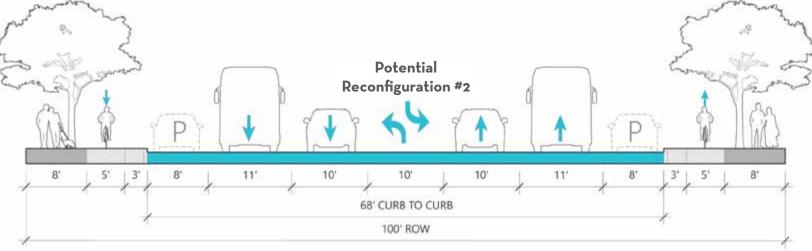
Potential Reconfiguration #2: One-Way, Sidewalk-Level Class IV Bikeway on an Arterial Street.
